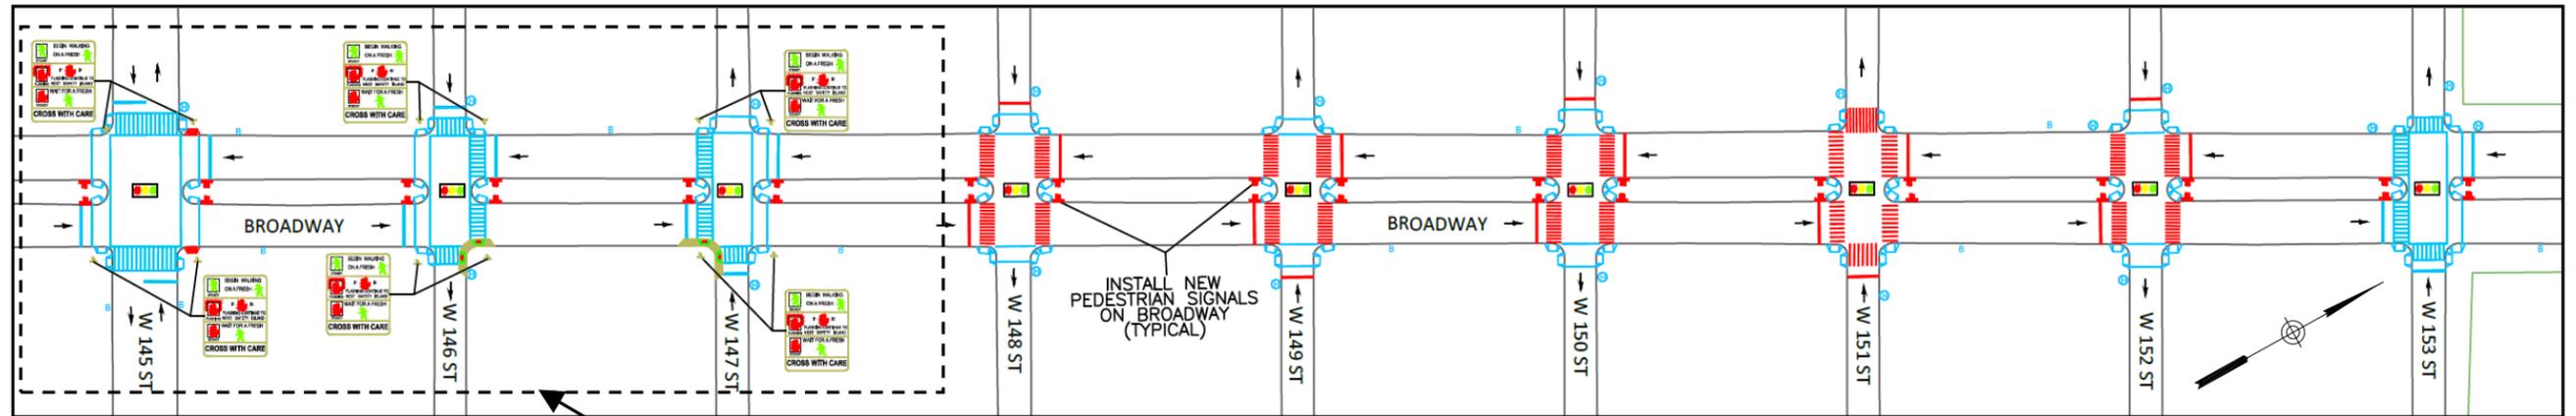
BROADWAY FROM W 145TH STREET TO W 153RD STREET
